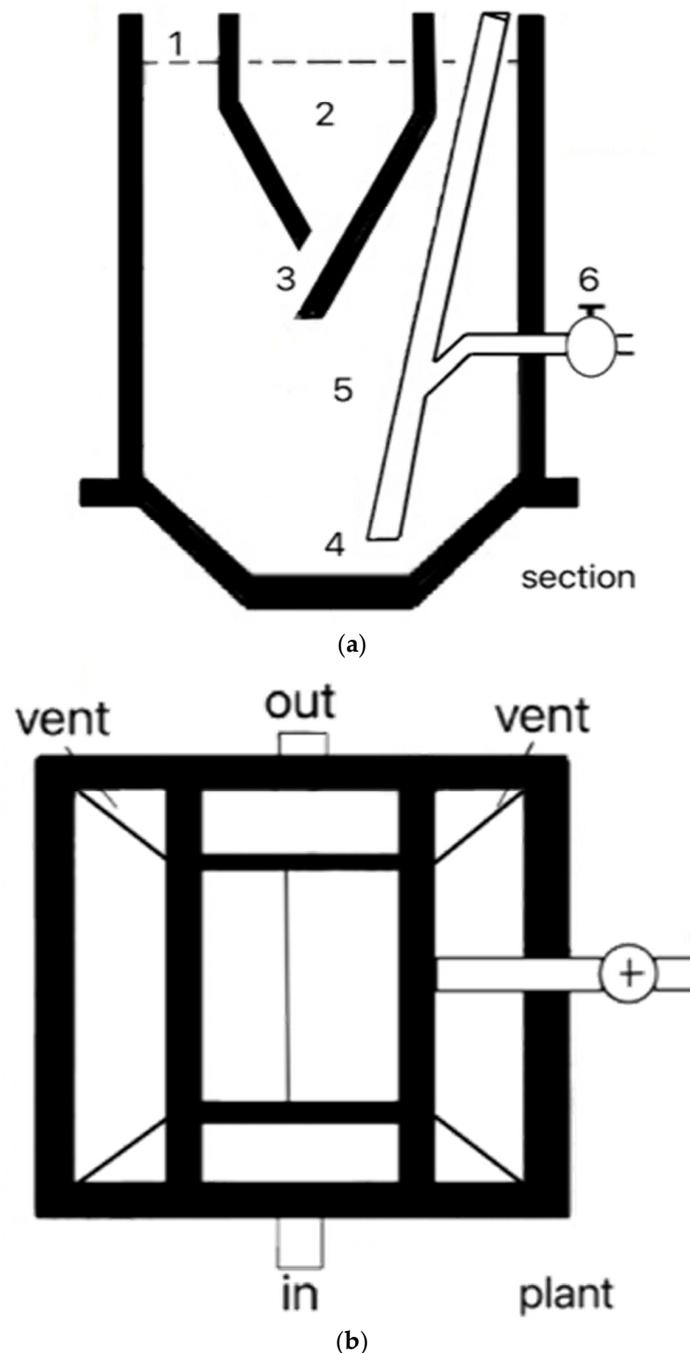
(a) Typical cross-section elevation adapted from [66] and (b) typical plan view of septic tank. Legend: IP = inspection port; AP = access port; SC = scum; B = baffles; SL = sludge.
